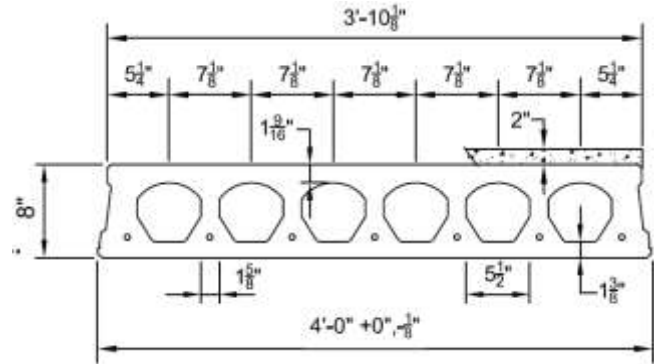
Cross section of a 8" x 4'-0" Precast Hollow Core Plank
